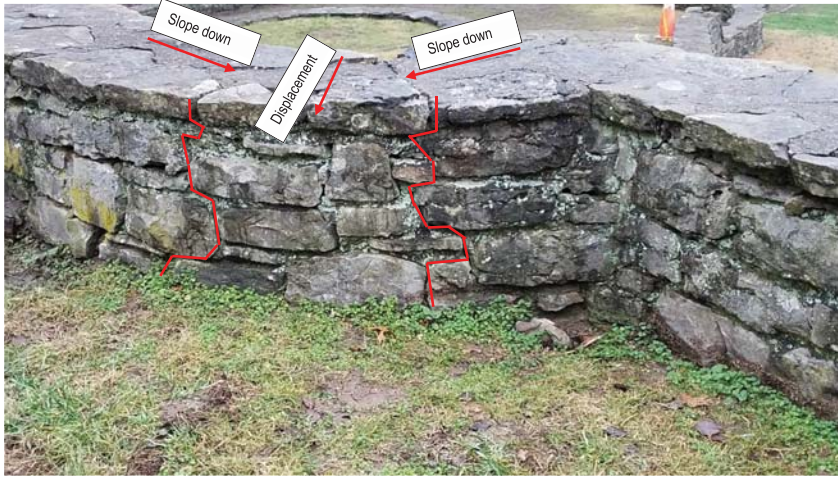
Crack through wall with settlement; Crack to be cut out and repointed
